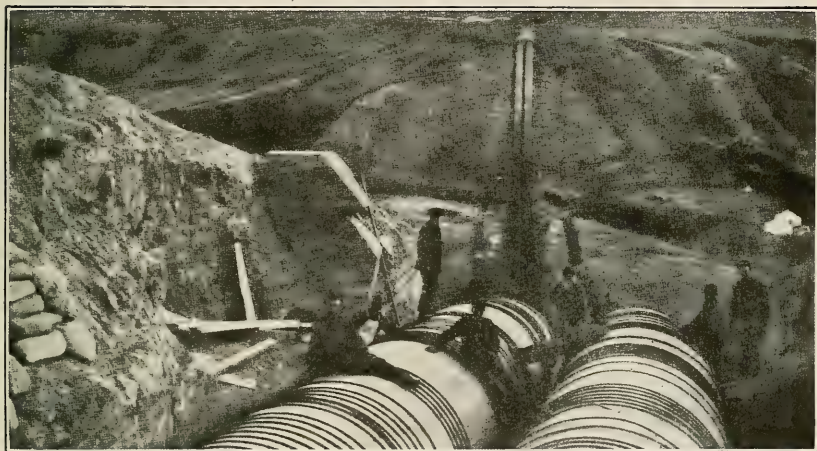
AN EXAMPLE OF TWIN LINE CONSTRUCTION.
